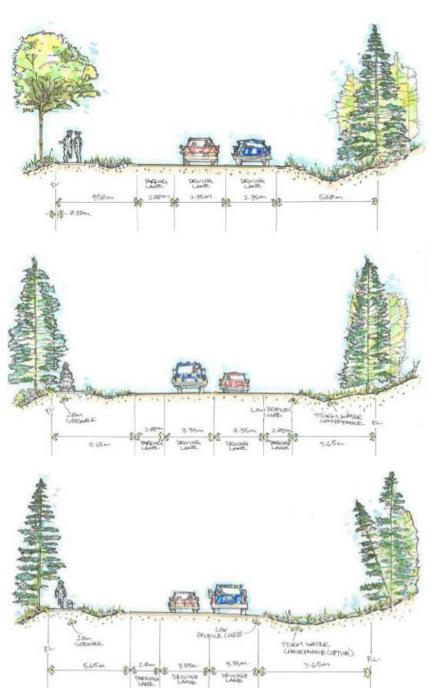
Residential Local 2-Way (RL2 - Parking one side) (17.5 m)
